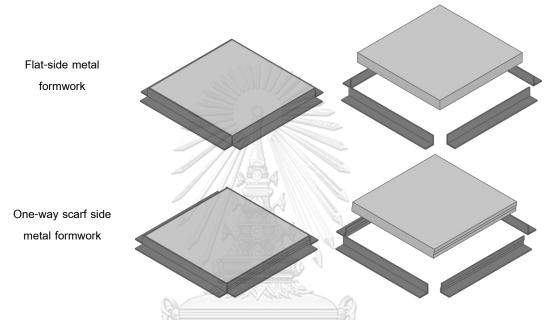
The illustration of precast concrete formwork of flat side panels and one-way scarf side panels.
